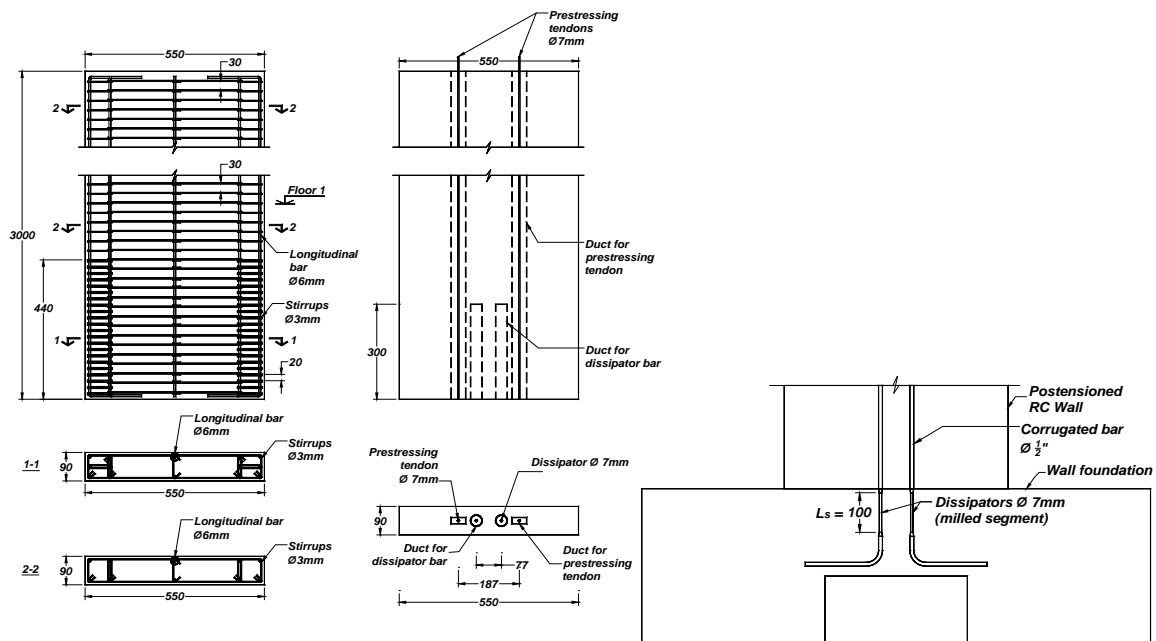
Test unit A2, dimensions in mm. Wall's transverse sections and reinforcement details.
